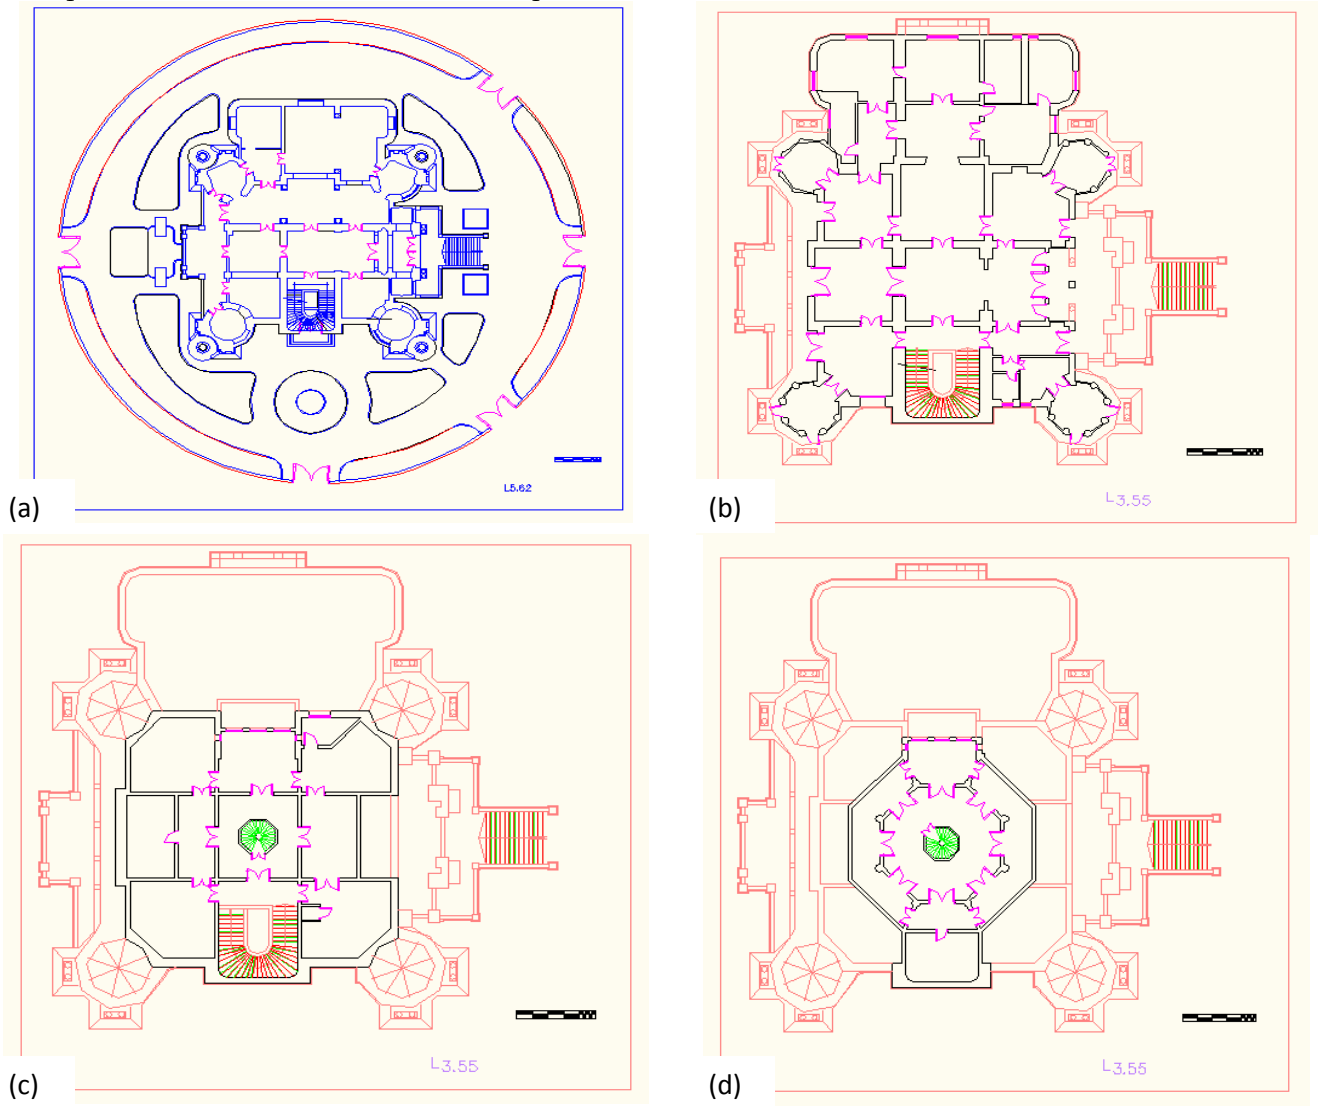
Plans view of the first (a), second (b), third (c) and fourth (d) floor of Sakakini palace. Cairo, Egypt.
